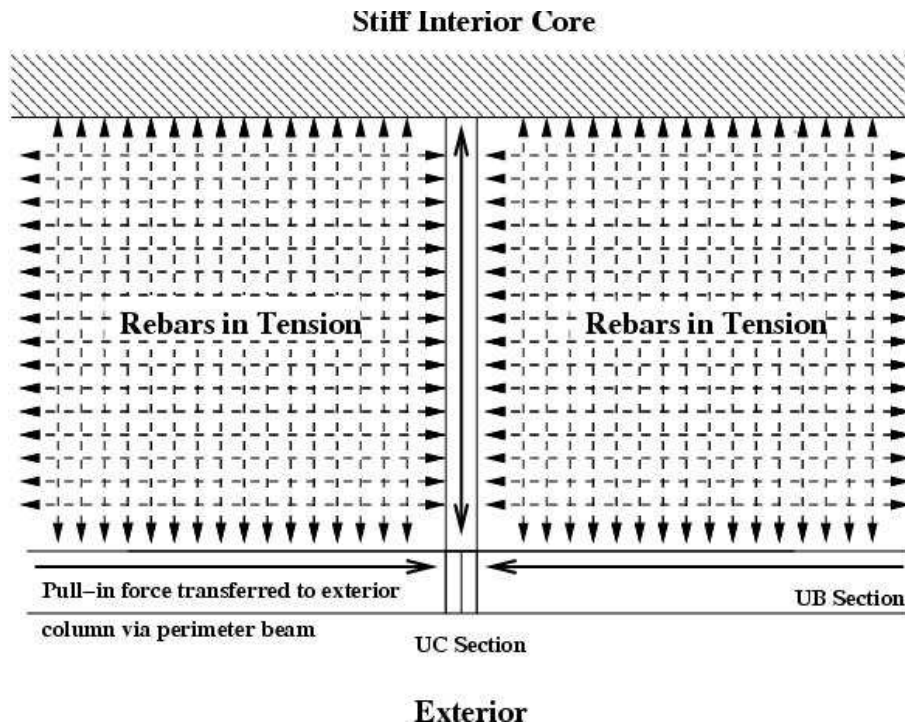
transfer of the pull-in forces from the steel reinforcement in the floor to the column
